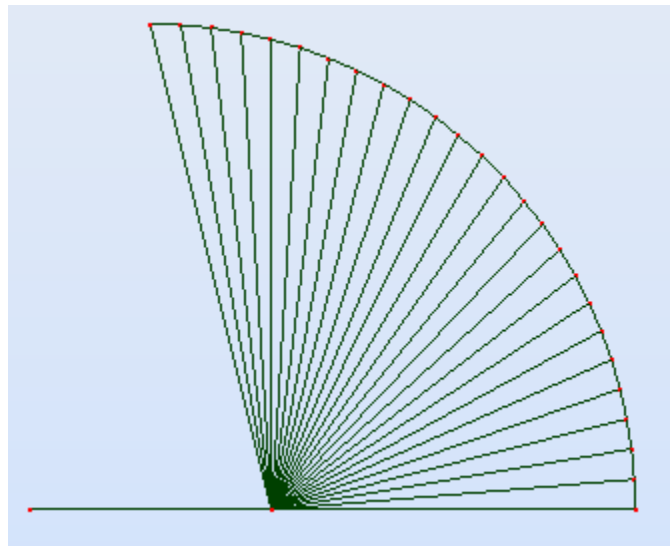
Cross-section of the quarter helix with deck connections
